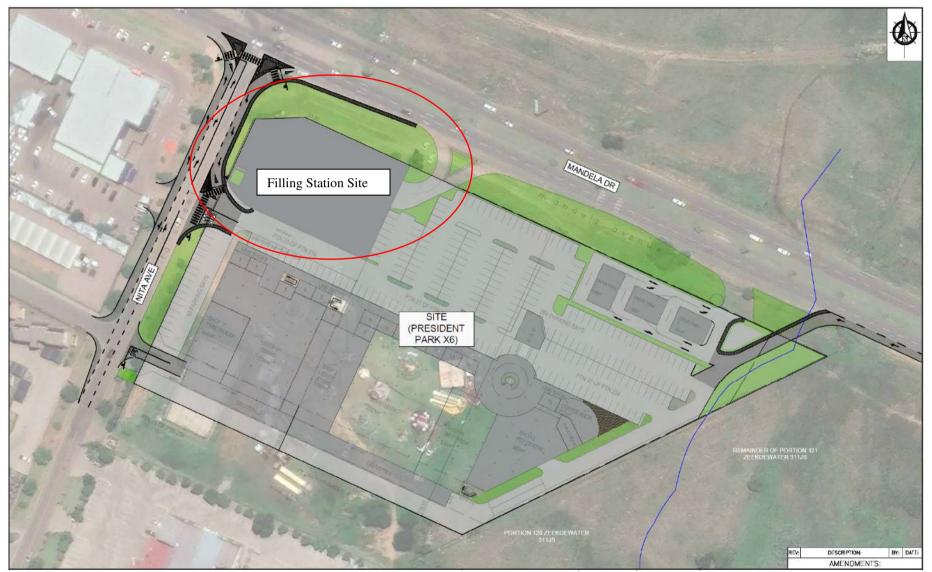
Layout plan approved w.r.t. proposed retail centre development (taken from EDL Consulting Engineers, 2021)
